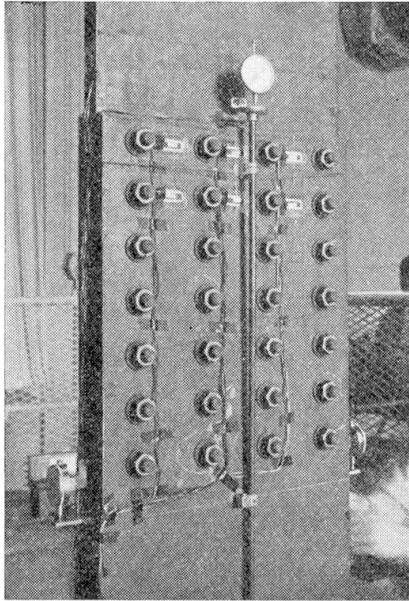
Joint mounted in testing machine with instrumentation attached.
